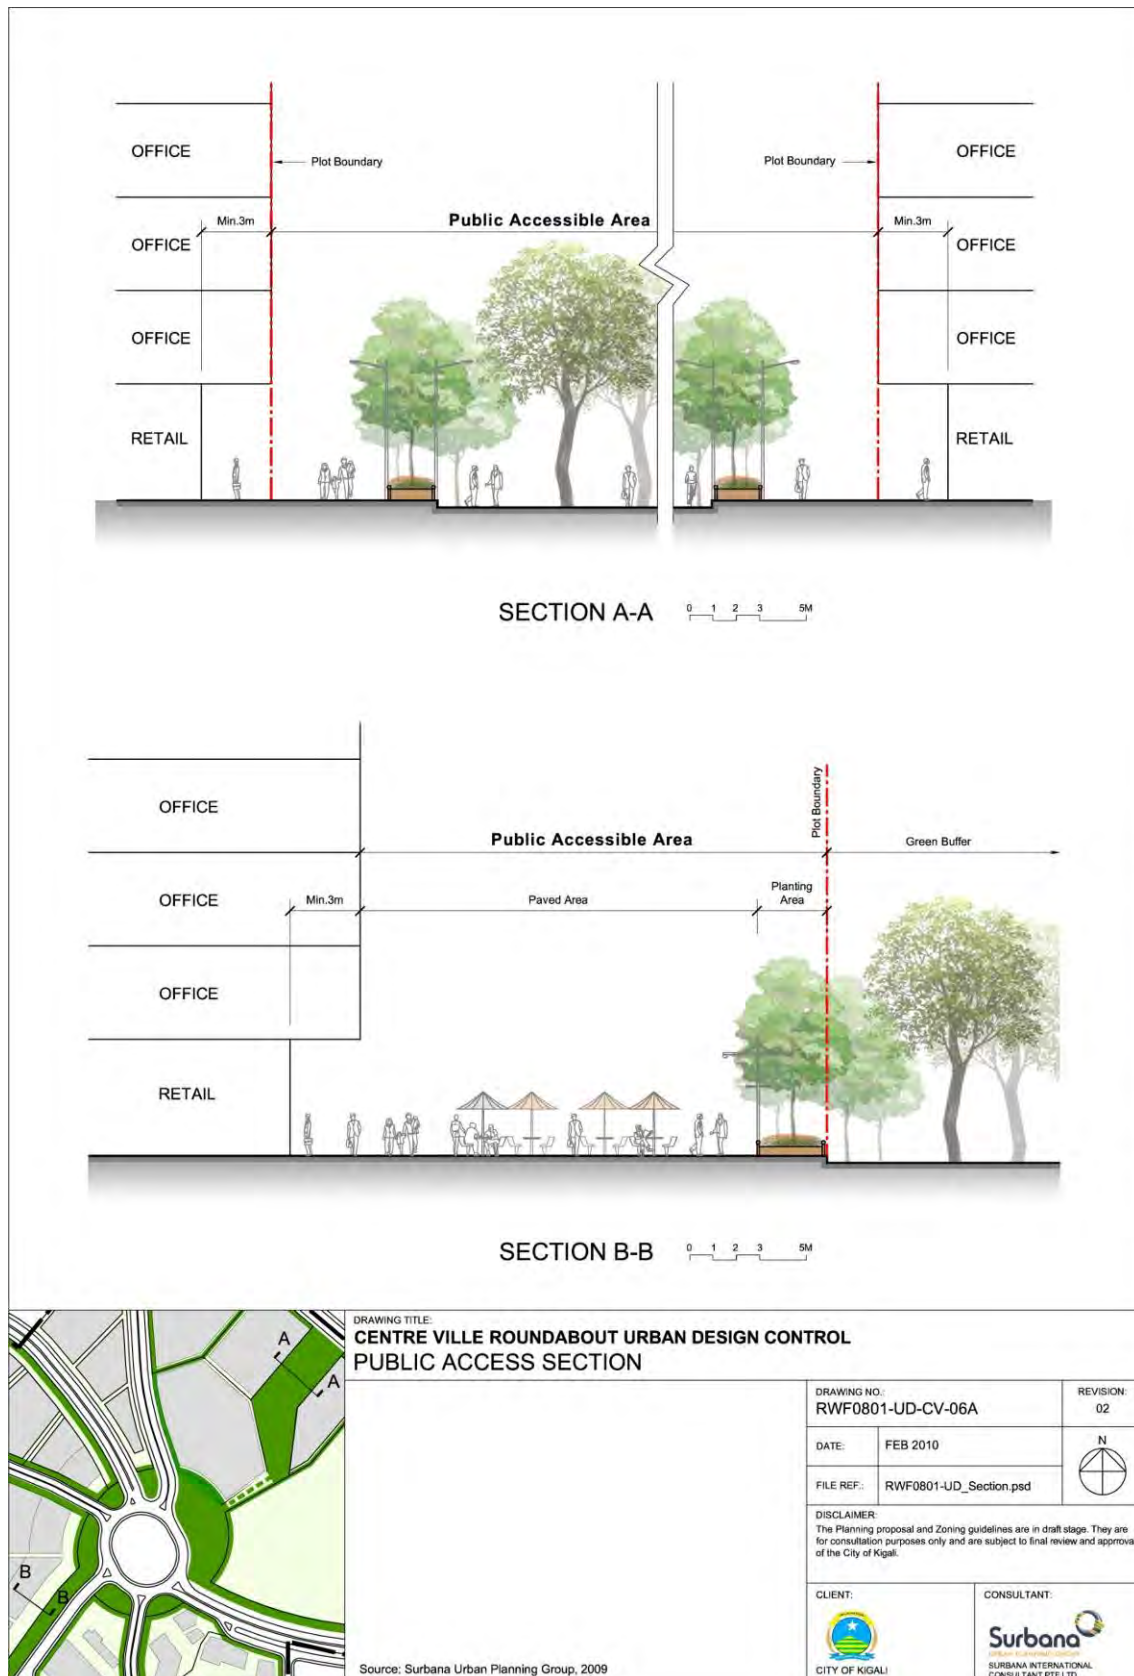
Centre Ville Roundabout Urban Design Control Public Access Section.
